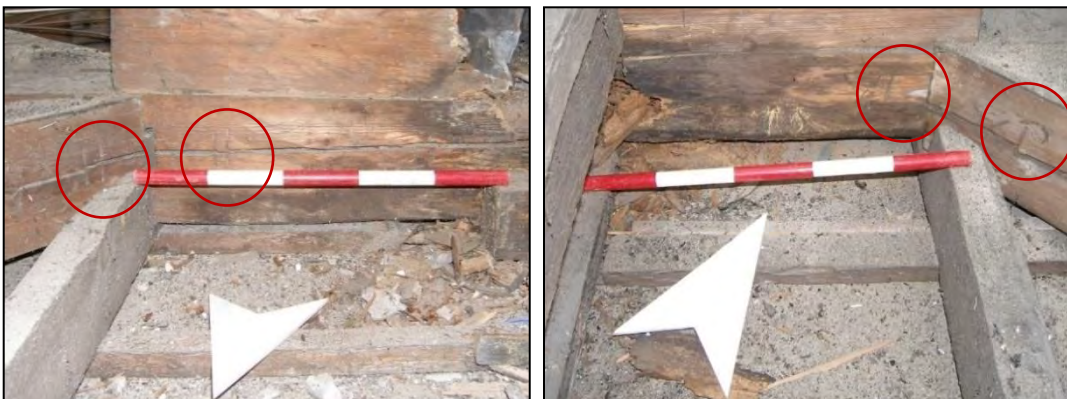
intersection of truss 203 and 204. The latter tied neither into the wall or truss 203. Gutter 146 is visible in the upper-left corner.
